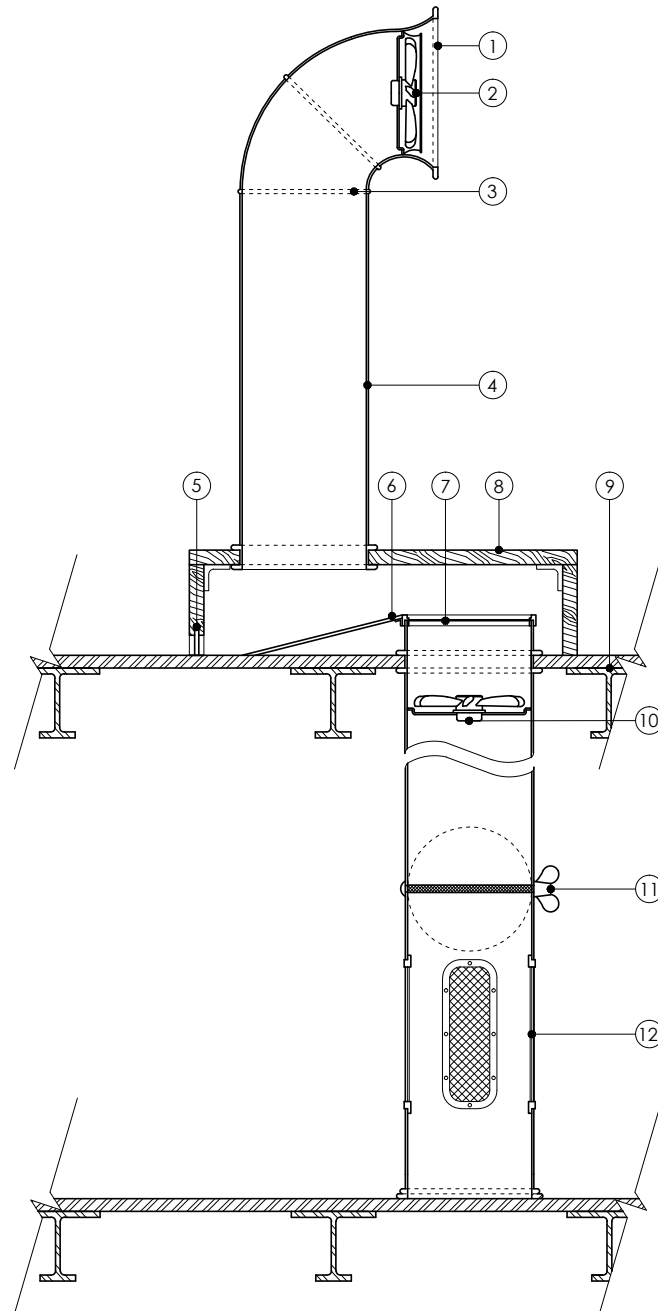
Acoustic Construction Detail (Author, 2016)
